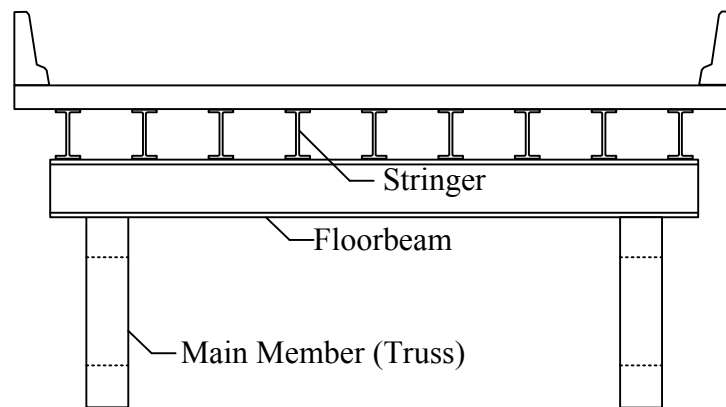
TRUSS-FLOORBEAM-STRINGER SYSTEM (DECK)
